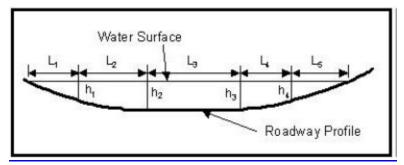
D - Cross Section of Flow over Embankment (Source TxDOT, Hydraulic Design Manual, 2011)
